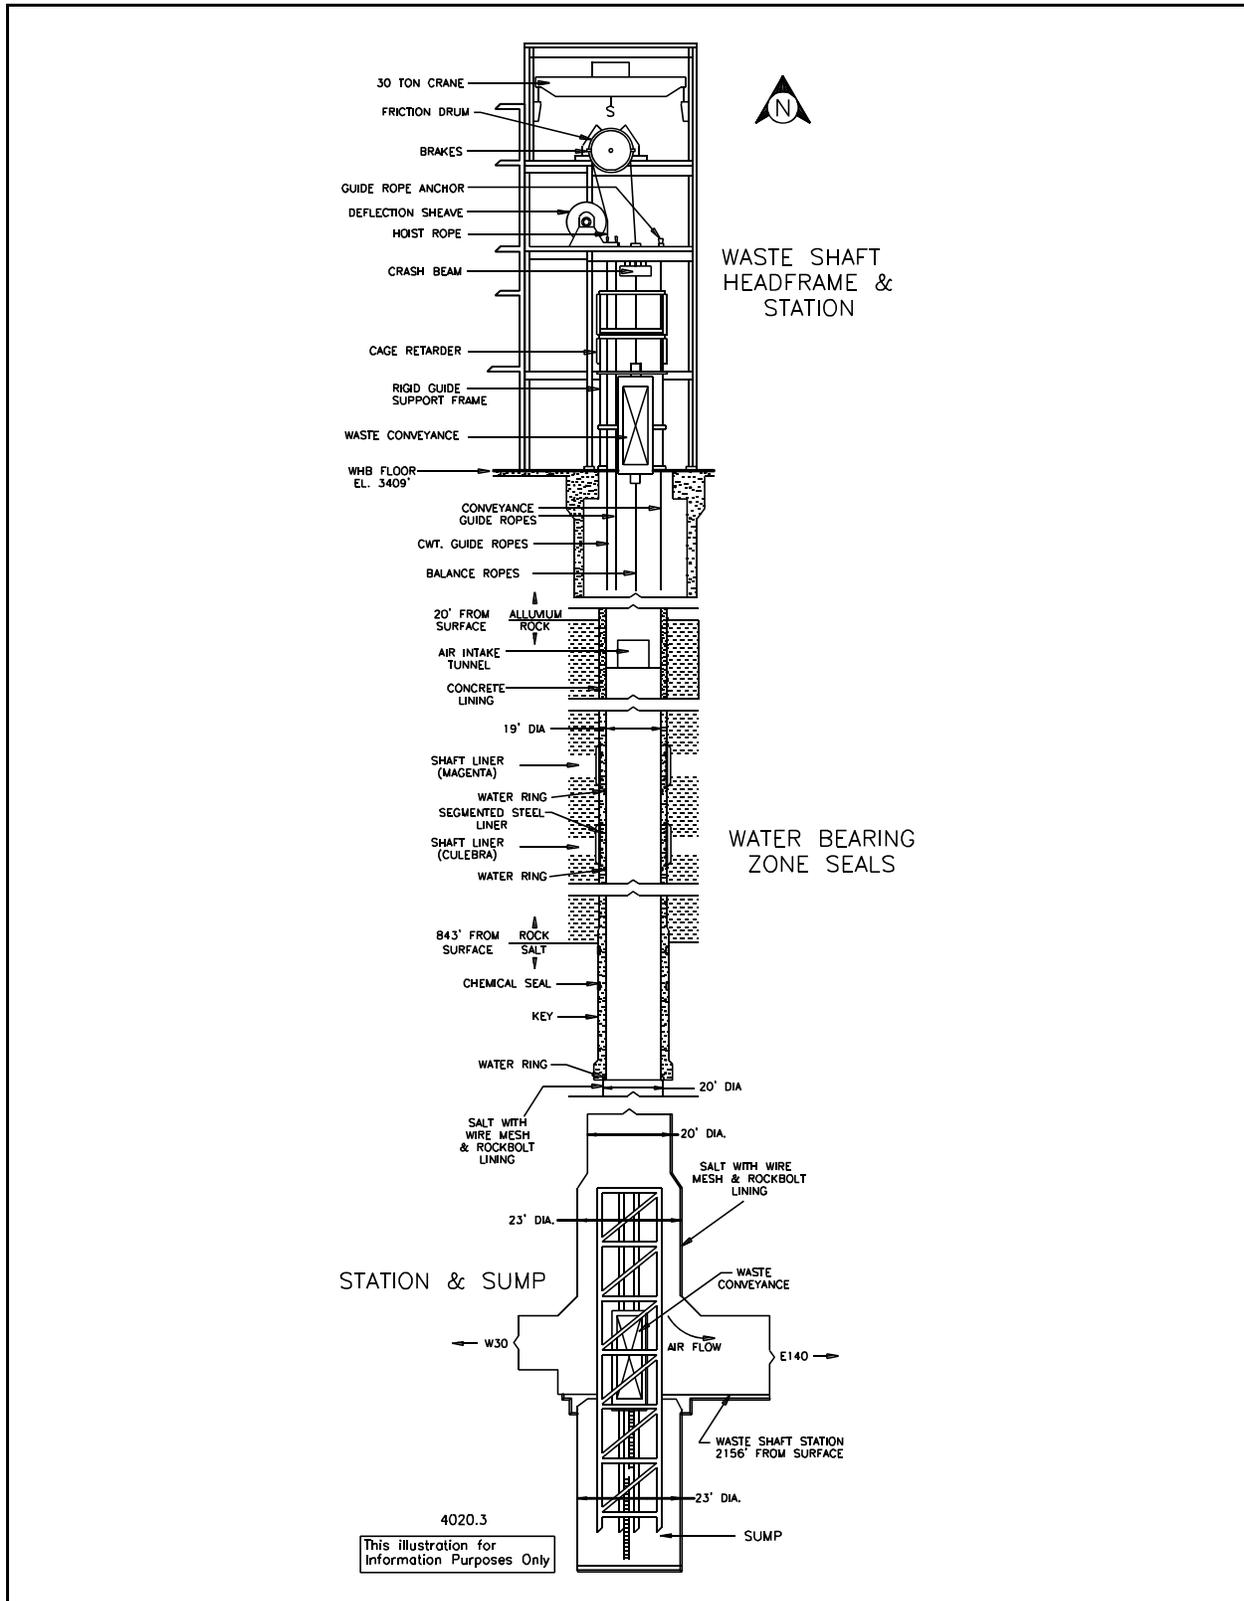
, Waste Shaft and Hoist Arrangement
